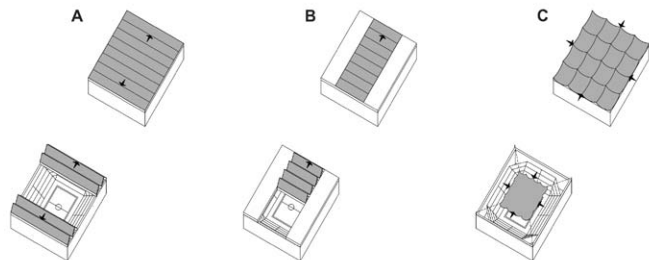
A. Folding of the entire roof structure B. Folding of individual roof parts (folding in the longitudinal direction of the building); C. Folding of individual smaller roof parts (folding into the centre of the building).
